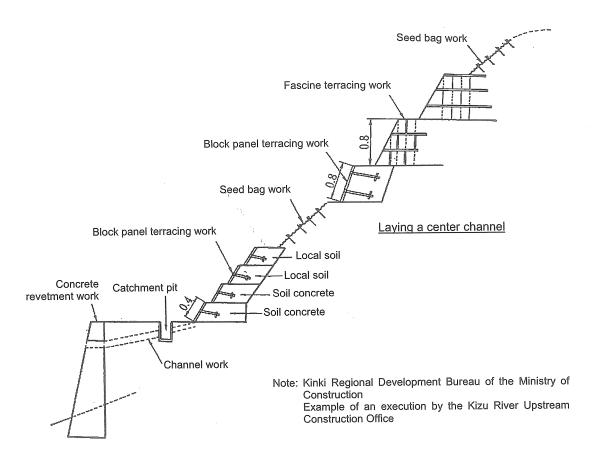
Sectional Diagram of Collapsed Ground (Sample Execution) (unit: m)
